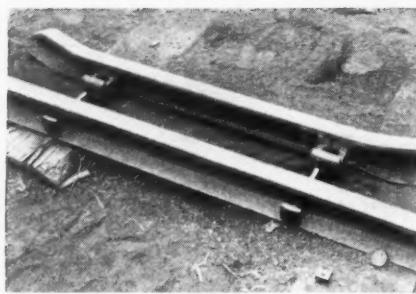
View of guard rail showing spacer blocks welded in place.
